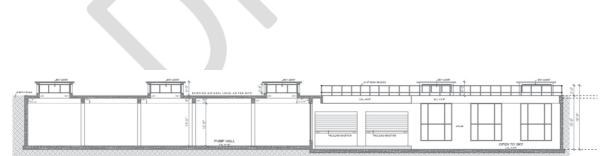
Proposed Section C-C of the HVAC structures near the Secretariat Building © Engineering Department Union Territory Chandigarh
